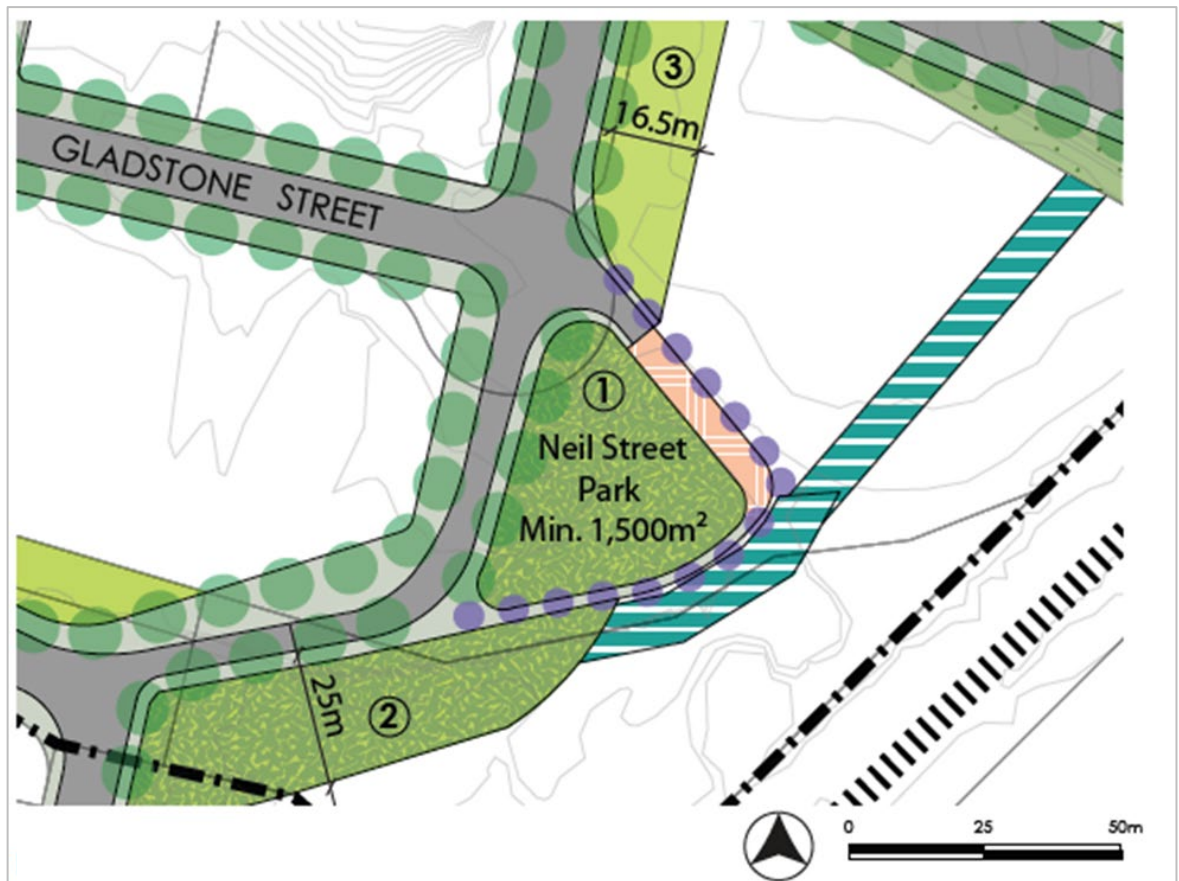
Neil Street Park, Canal Park and Boulevard Park
